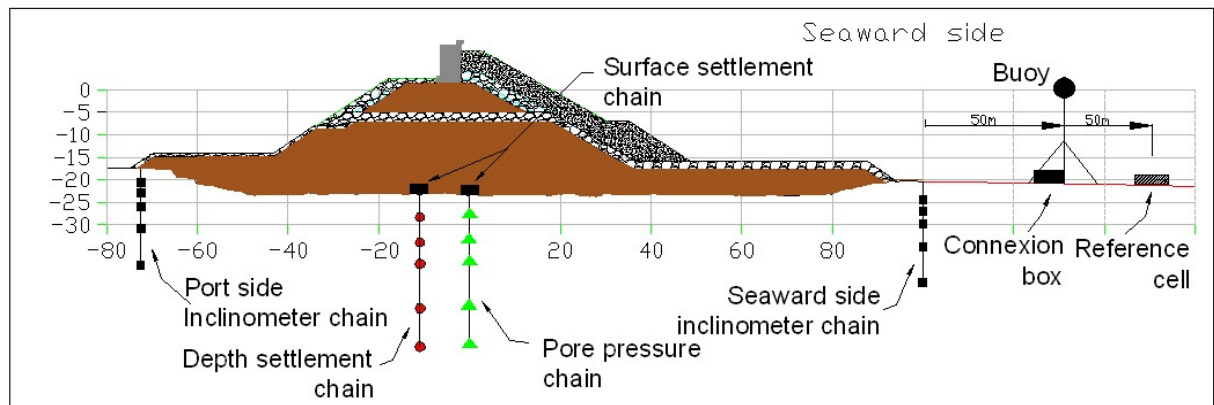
Typical cross section for rubble mound breakwater instrumentation.
